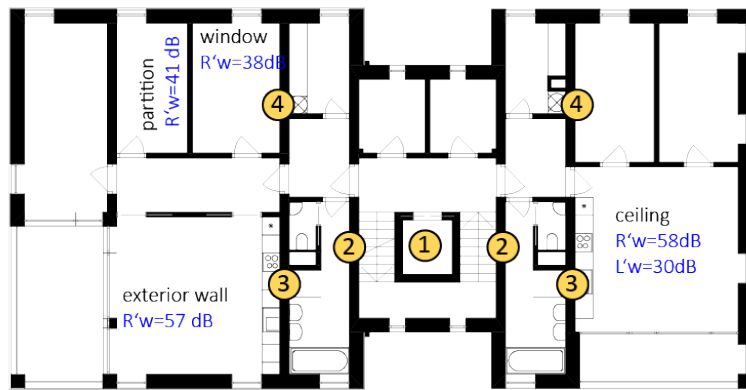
Villa Houses Krásnopolská natural ventilation in 2nd floor apartments (1:500) (source: author)
